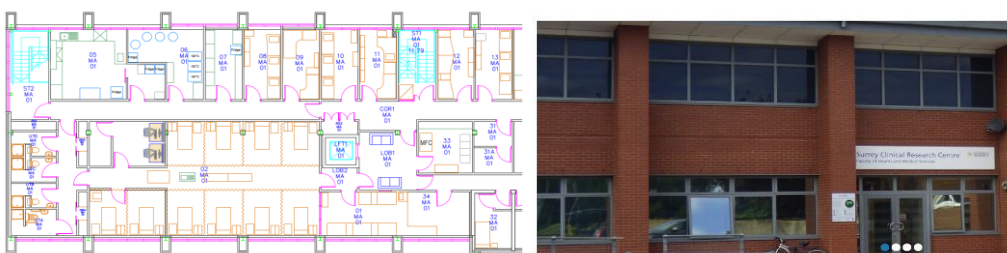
(above) Digital Health Ward floor plan and front elevation of CRC building
